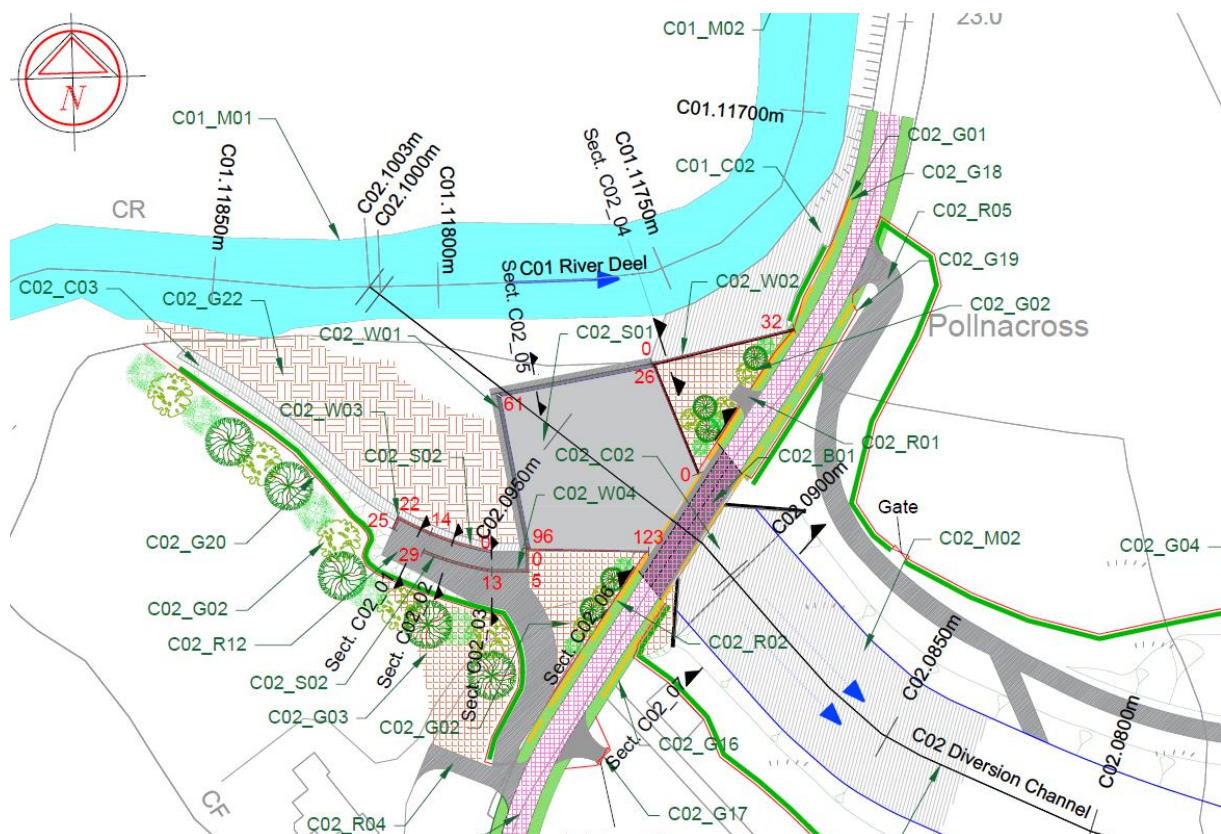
Plan view of diversion channel inlet weir upstream of Pollnacross Bridge
